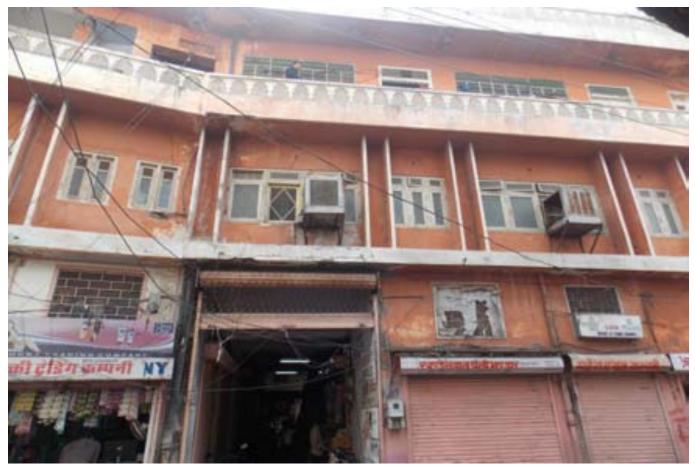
Wall No. 1, 2 & 4 of Shop No.764 of Ground Floor Covered With Material
